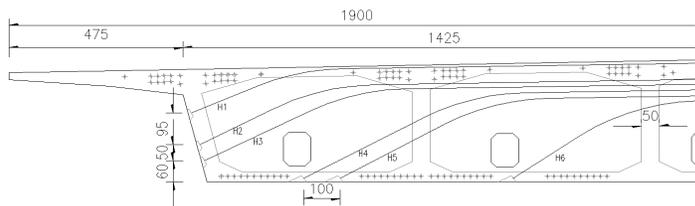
Cable zone crossbeam prestressed steel arrangement layout (unit cm)
